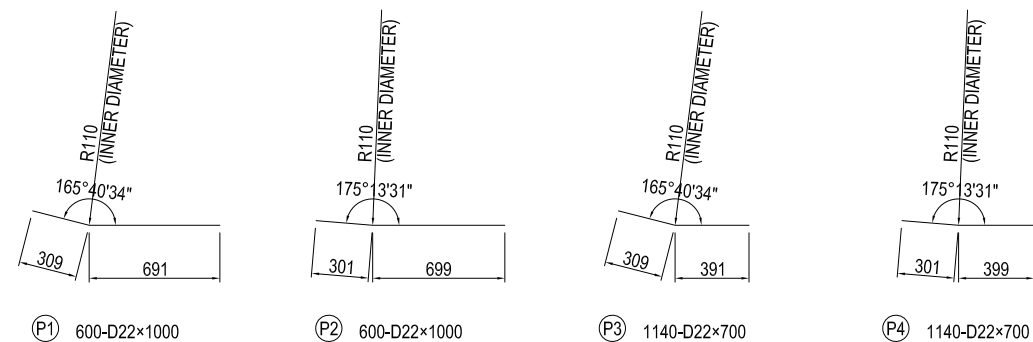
## DETAIL OF CONNECTION BETWEEN STEEL PIPE SHEET PILE AND FOOTING S=1:40
